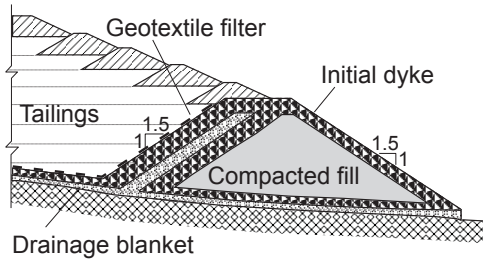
Double layer barrier for upstream waterproofing at Maracás dam.
